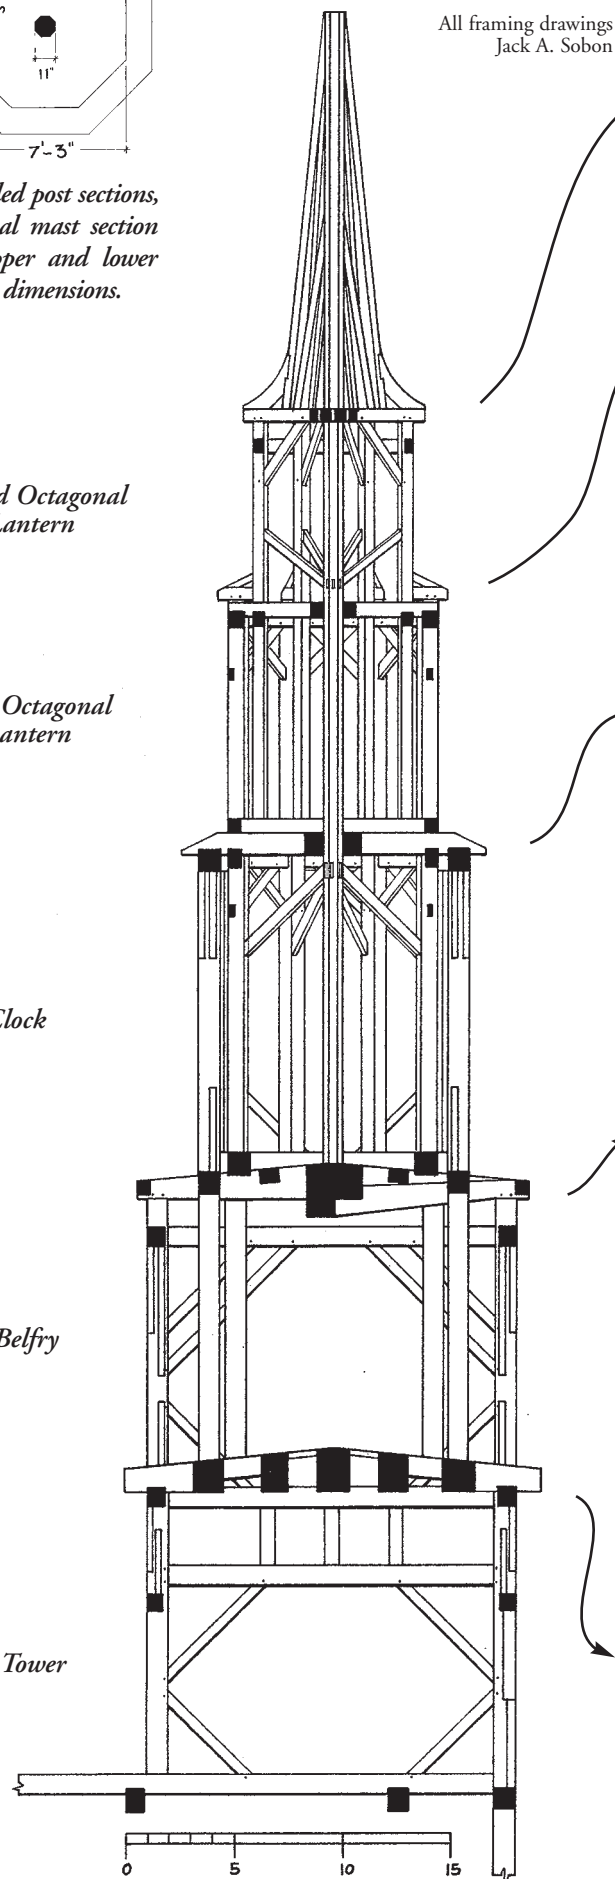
Steeple frame side elevation, cut away to show original mast. Mast is now refooted one stage higher, at top of clock stage.
